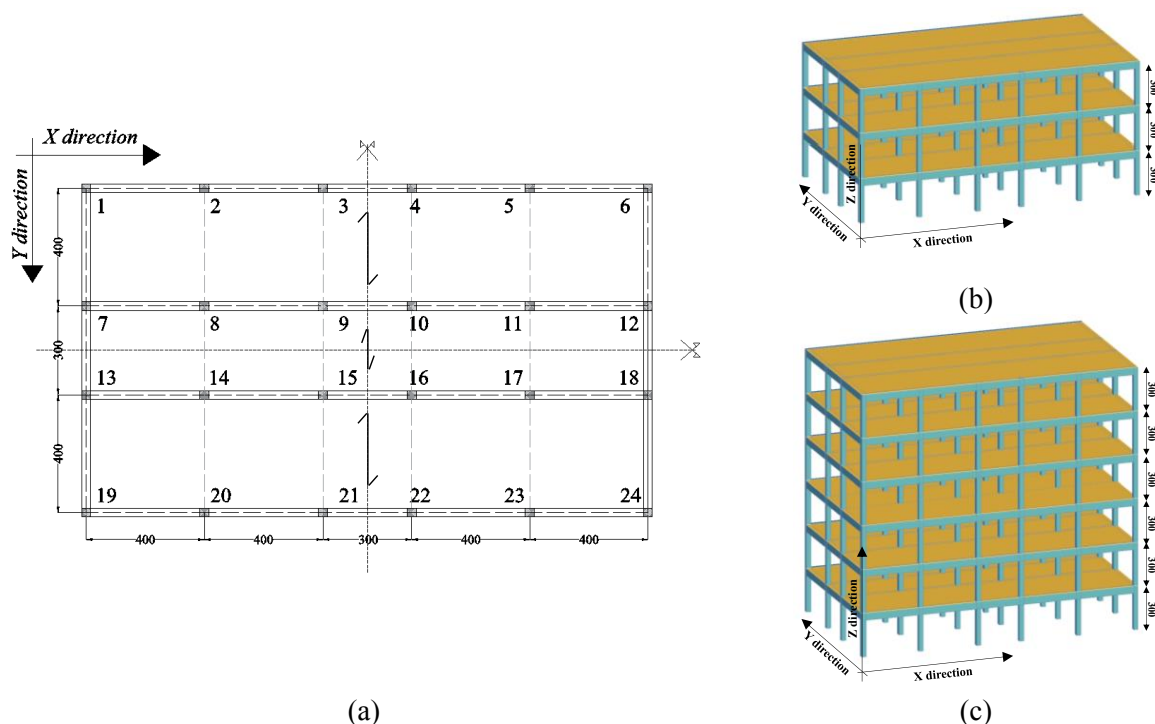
Plan (a) and 3D (b-c) views of analyzed case-study buildings. (Dimensions in centimeters)
